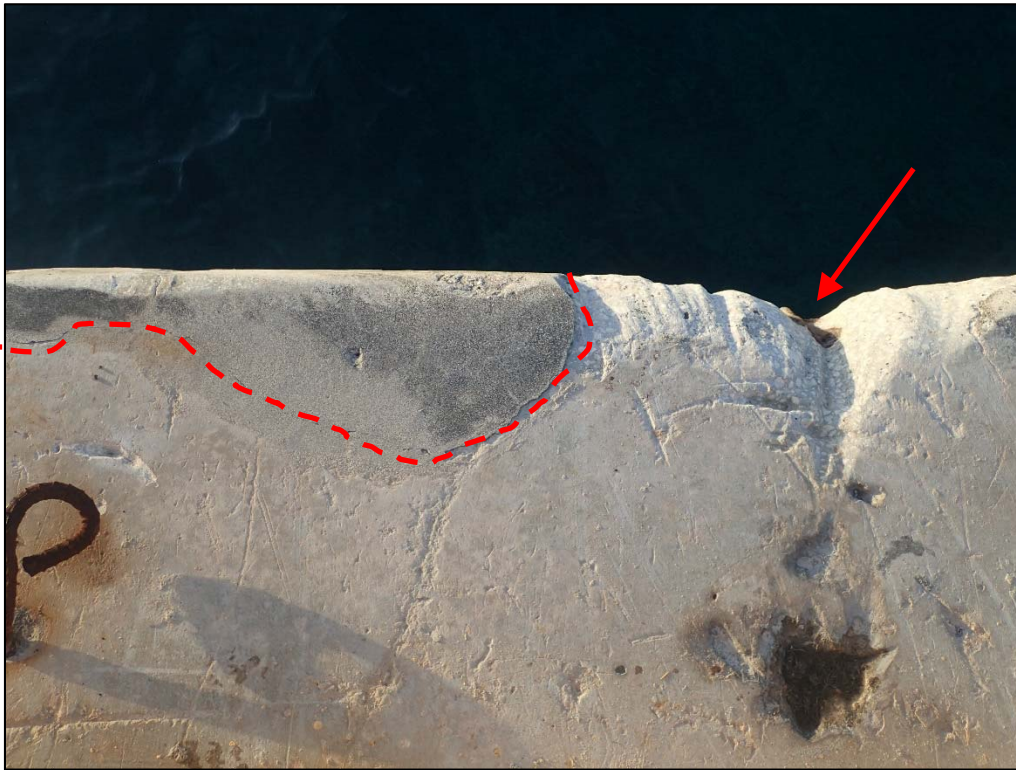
Berth 1 concrete cap Station 1+05. A repaired spall seen on the left (red dashed line) on top of the cap at Berth 1. There are a total of four repaired spalls at Berth 1. Typical abrasion damage with exposed rebar on the right (red arrow).
